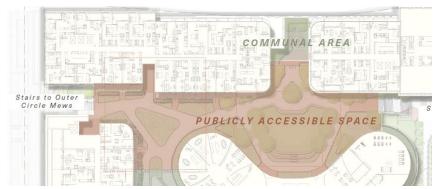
proposed amended publicly accessible Paper Trail Gardens
